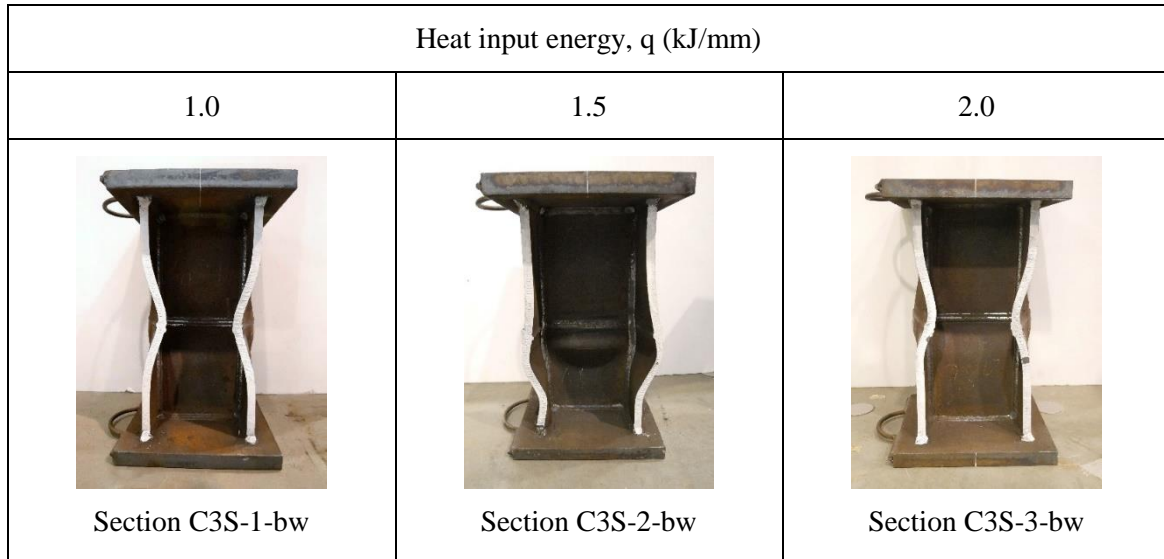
Typical deformed shapes of S690 welded H-sections after tests
